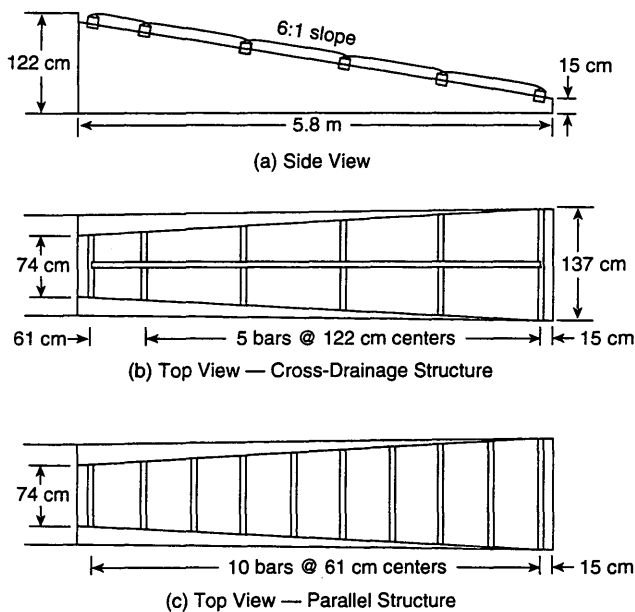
Safety end sections with 6:1 slopes for 122-cm (48-in.) pipe culverts.
